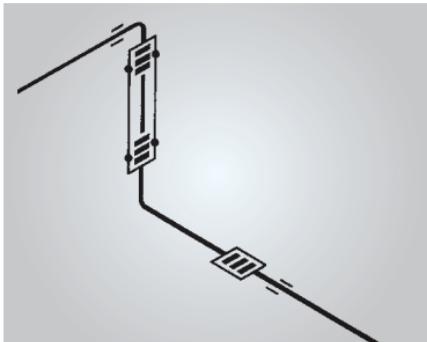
3-dimensional three-hinge system with lateral and angular expansion joints
